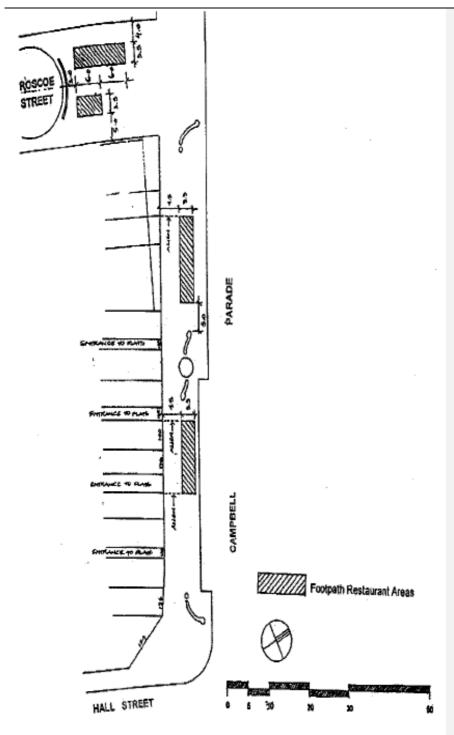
Campbell Parade, Bondi Beach (Hall Street to Roscoe Street, including Roscoe Street).
